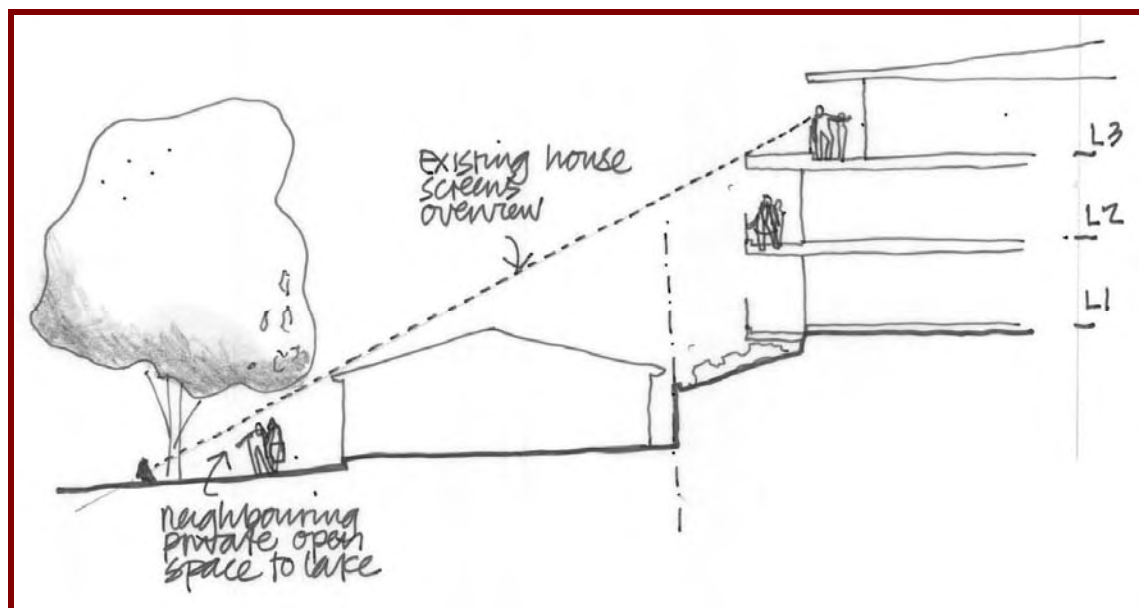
Sketch of section through east end of proposal and adjoining dwelling.
